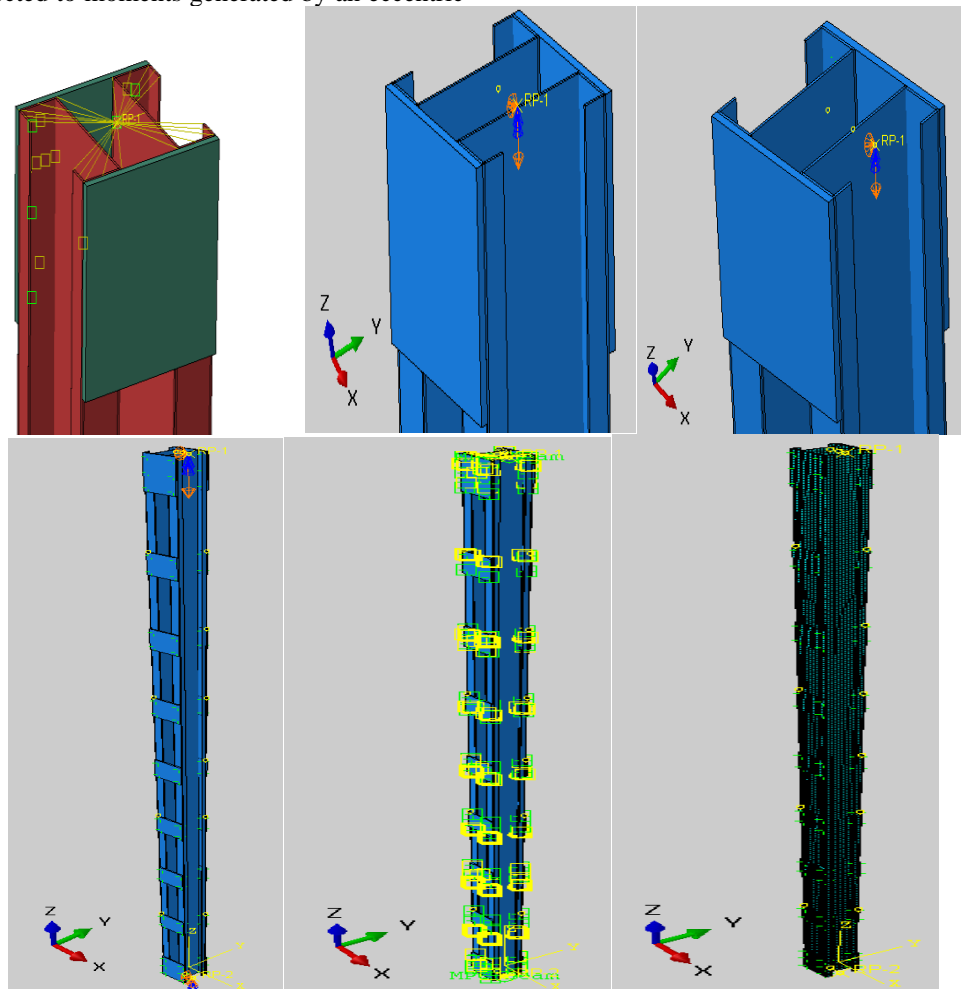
Finite elements mesh, load application Fastener modeling, and Boundary conditions
